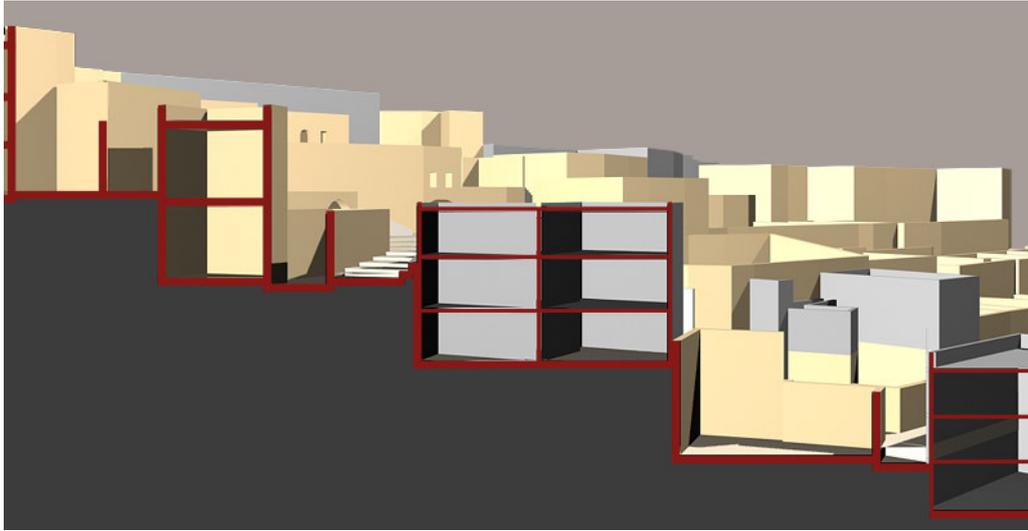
Section A3: The incongruent reinforced concrete structure in parcel B. See also view 12 and 22 in Fig 2.12.
